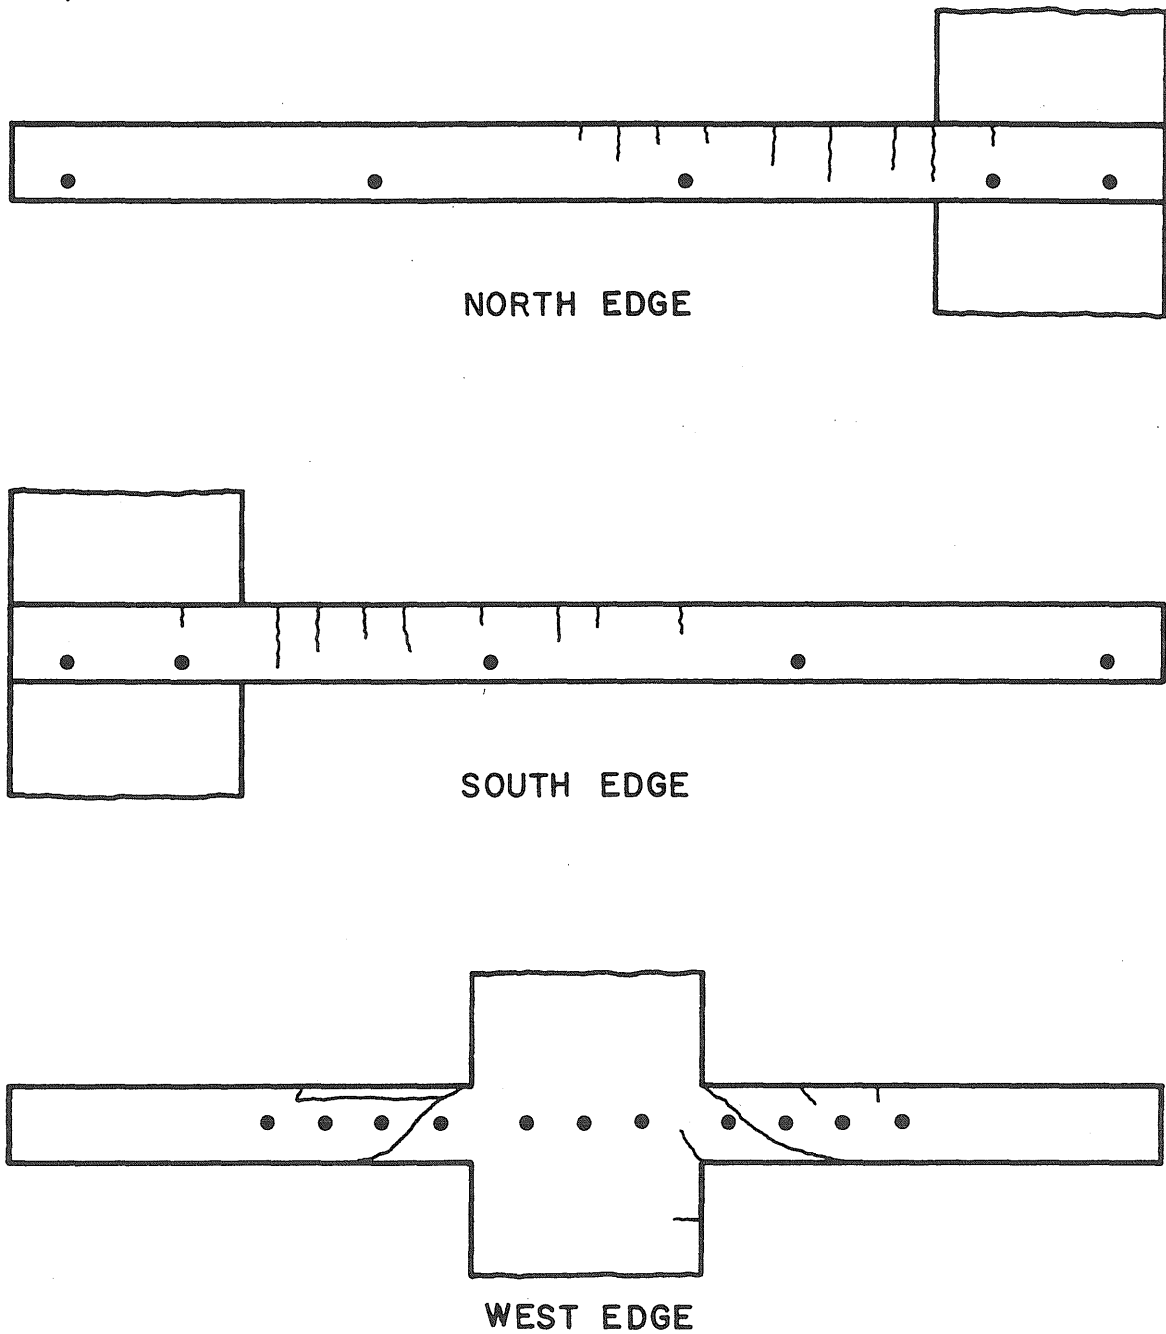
Crack Pattern at Failure on the North, South and West Edges of Specimen S1
